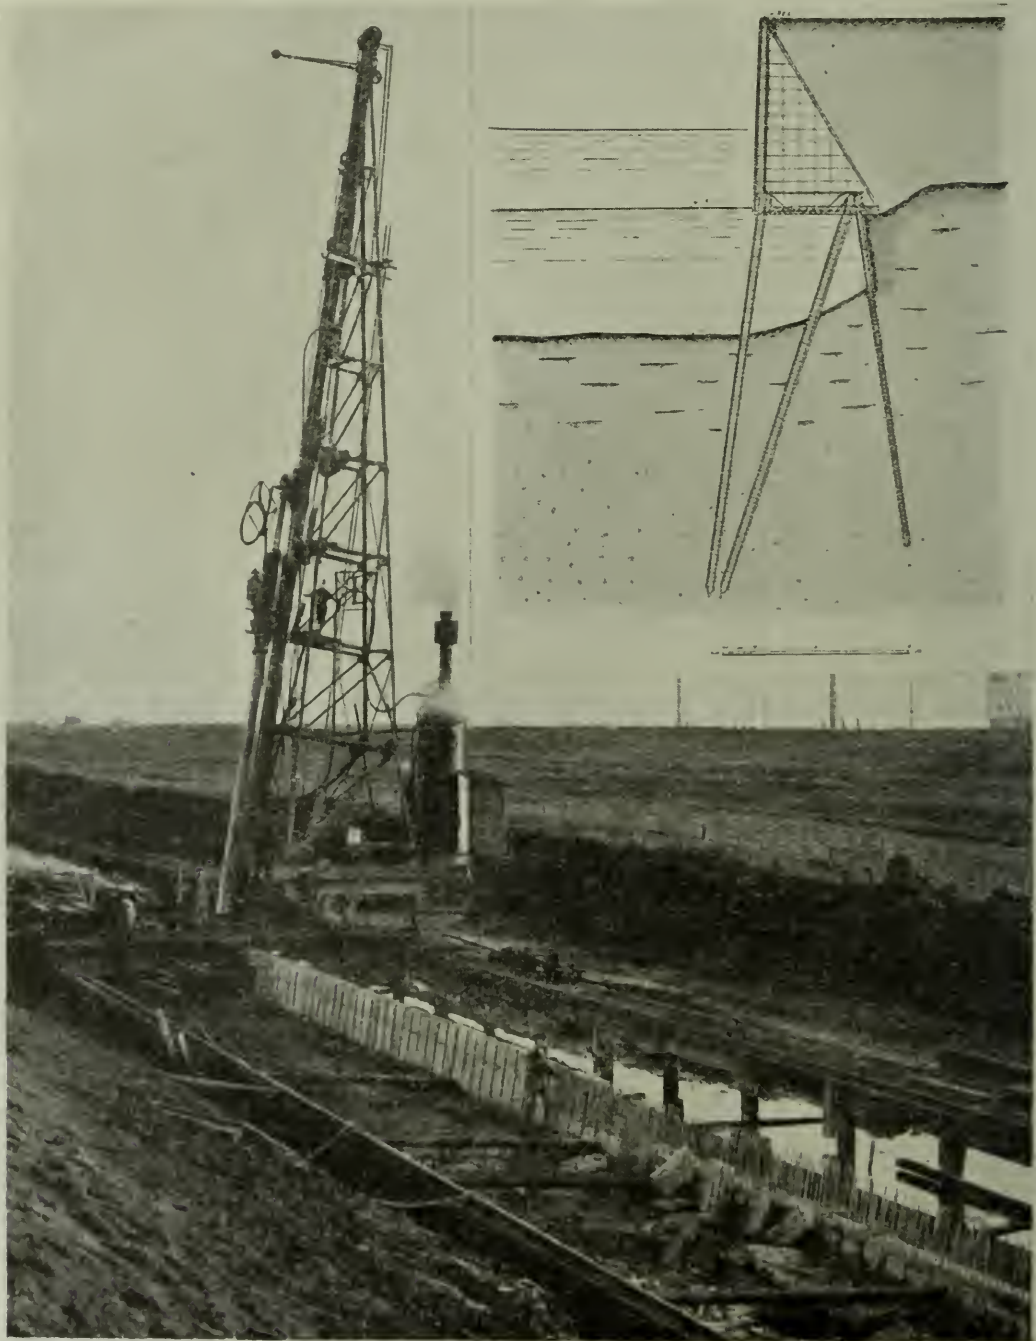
QUAY WALL WITH 22 FT. DEPTH OF WATER. TYPICAL CROSS SECTION, SHOWING SHEET WALL BEHIND AND COUNTERFORTED FRONT WALL.
